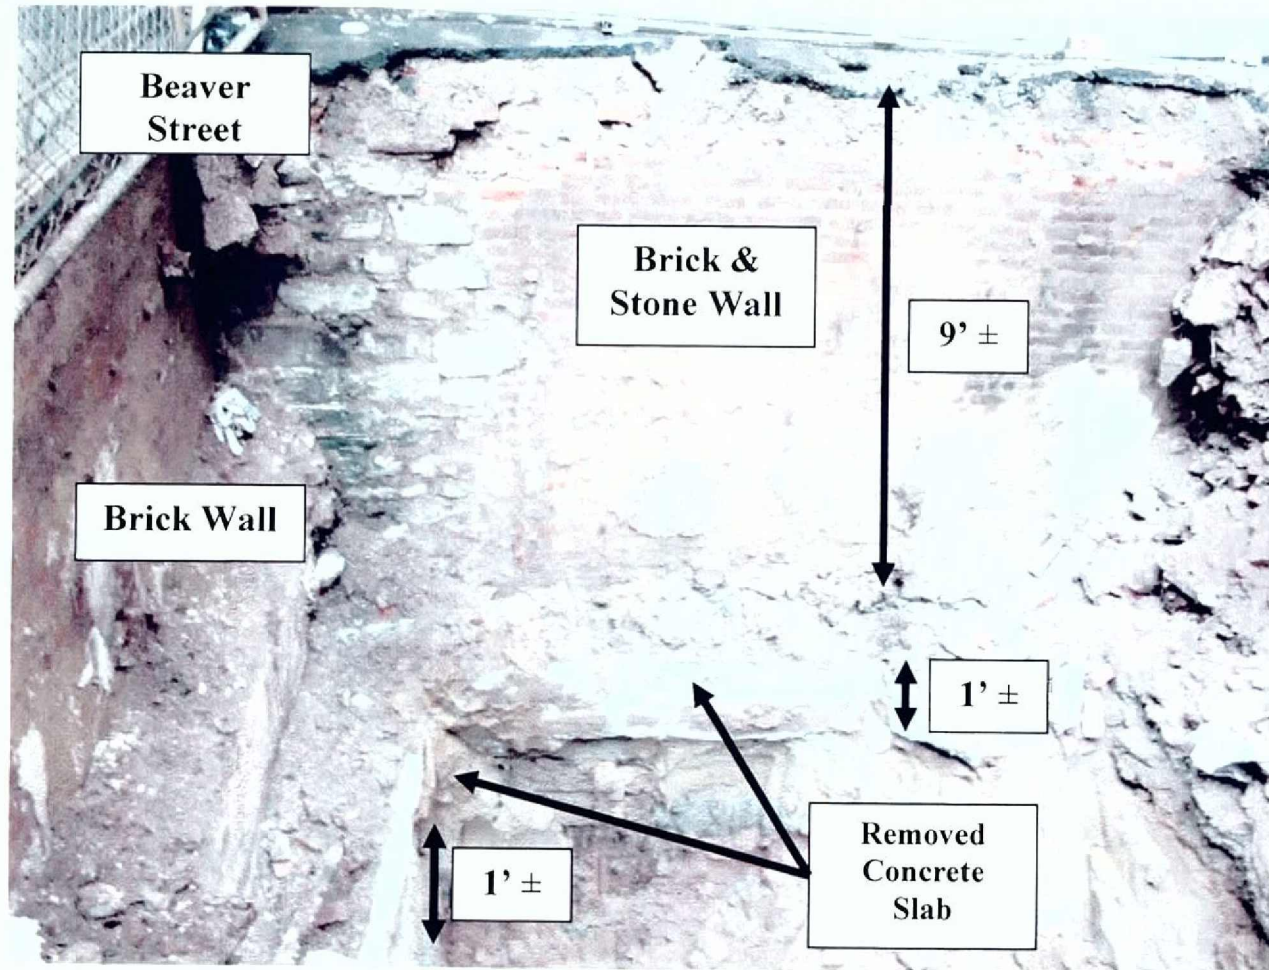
TP-6 (East pit): Facing West-Bottom of brick and tile walls, where they meet; concrete slab.
